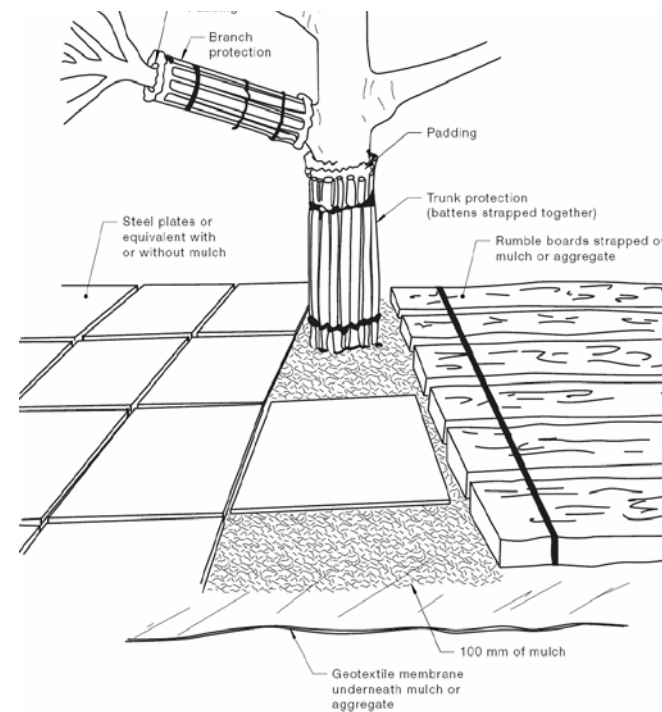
EXAMPLES OF TRUNK, BRANCH AND GROUND PROTECTION
